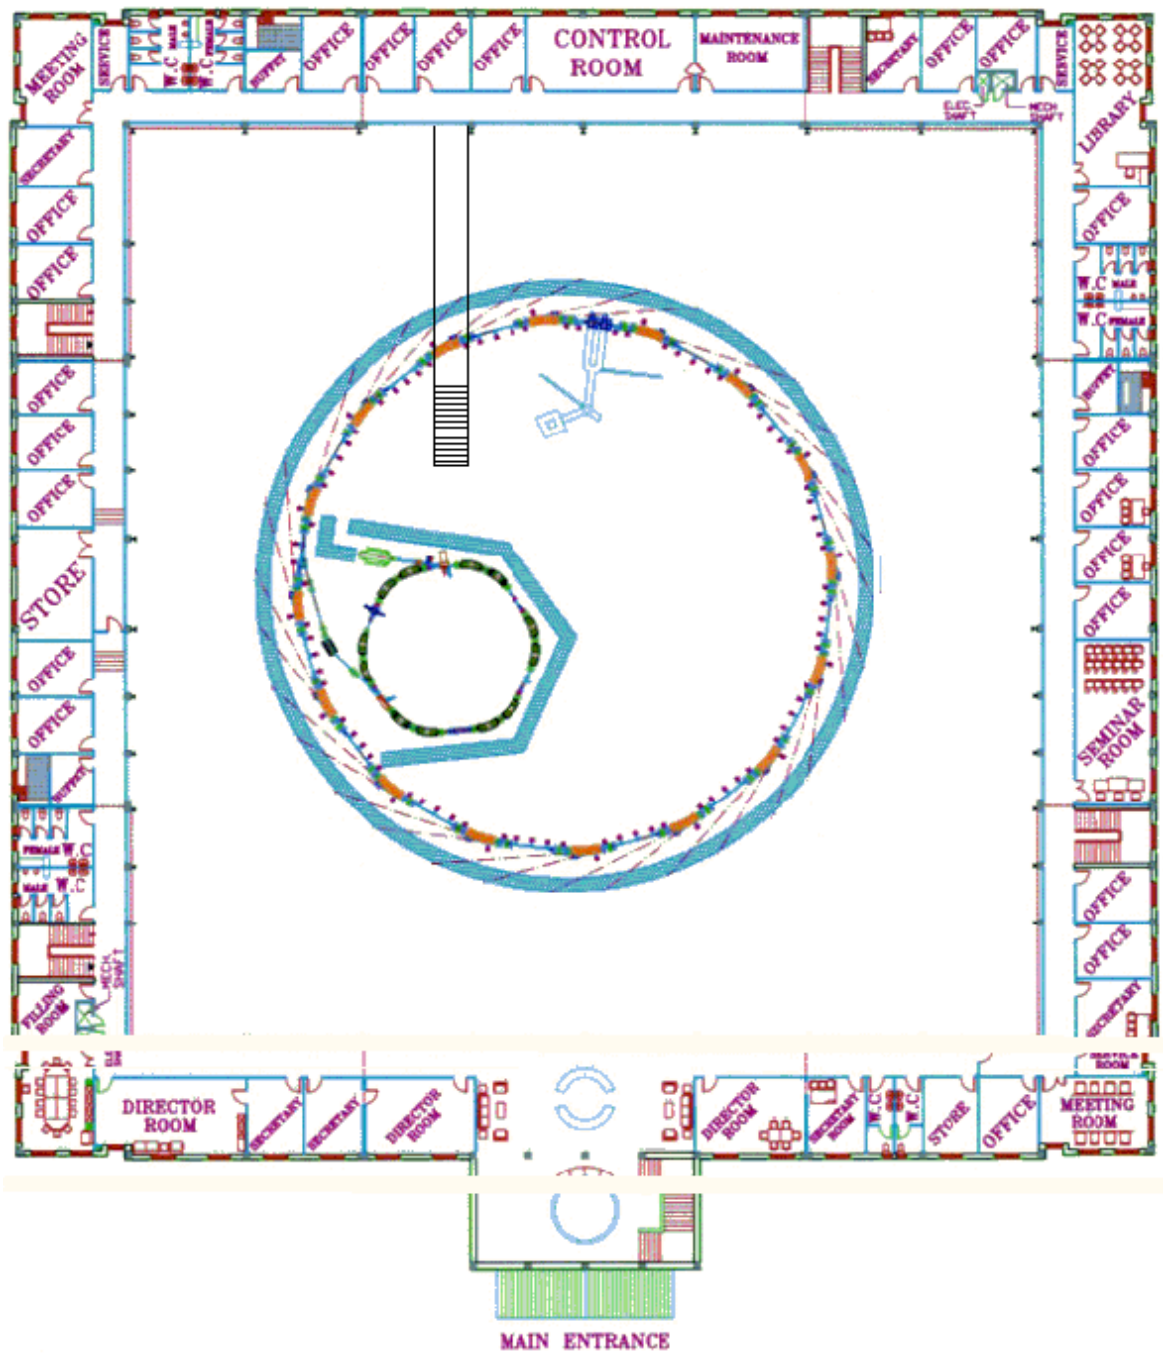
The layout of the first floor of the synchrotron light source SESAME with a view of the ground floor. Indicated is the location of the storage ring with the shielding wall around the accelerator and the bridge for having access to the storage ring area. All equipments for running the storage will be placed inside the shielding wall.
